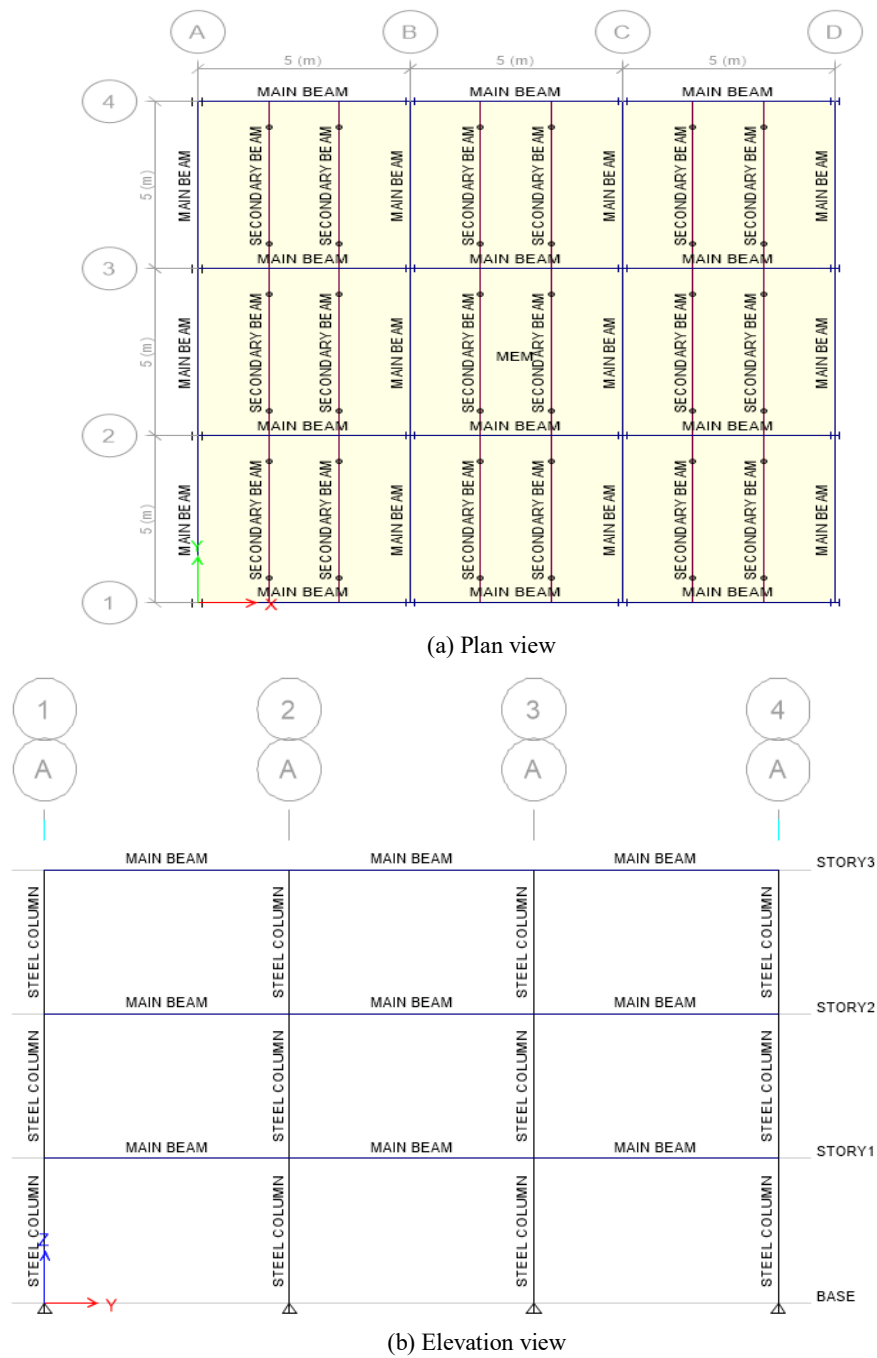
Plan and elevation view of the ordinary moment steel frame buildings without viscoelastic damping system.
